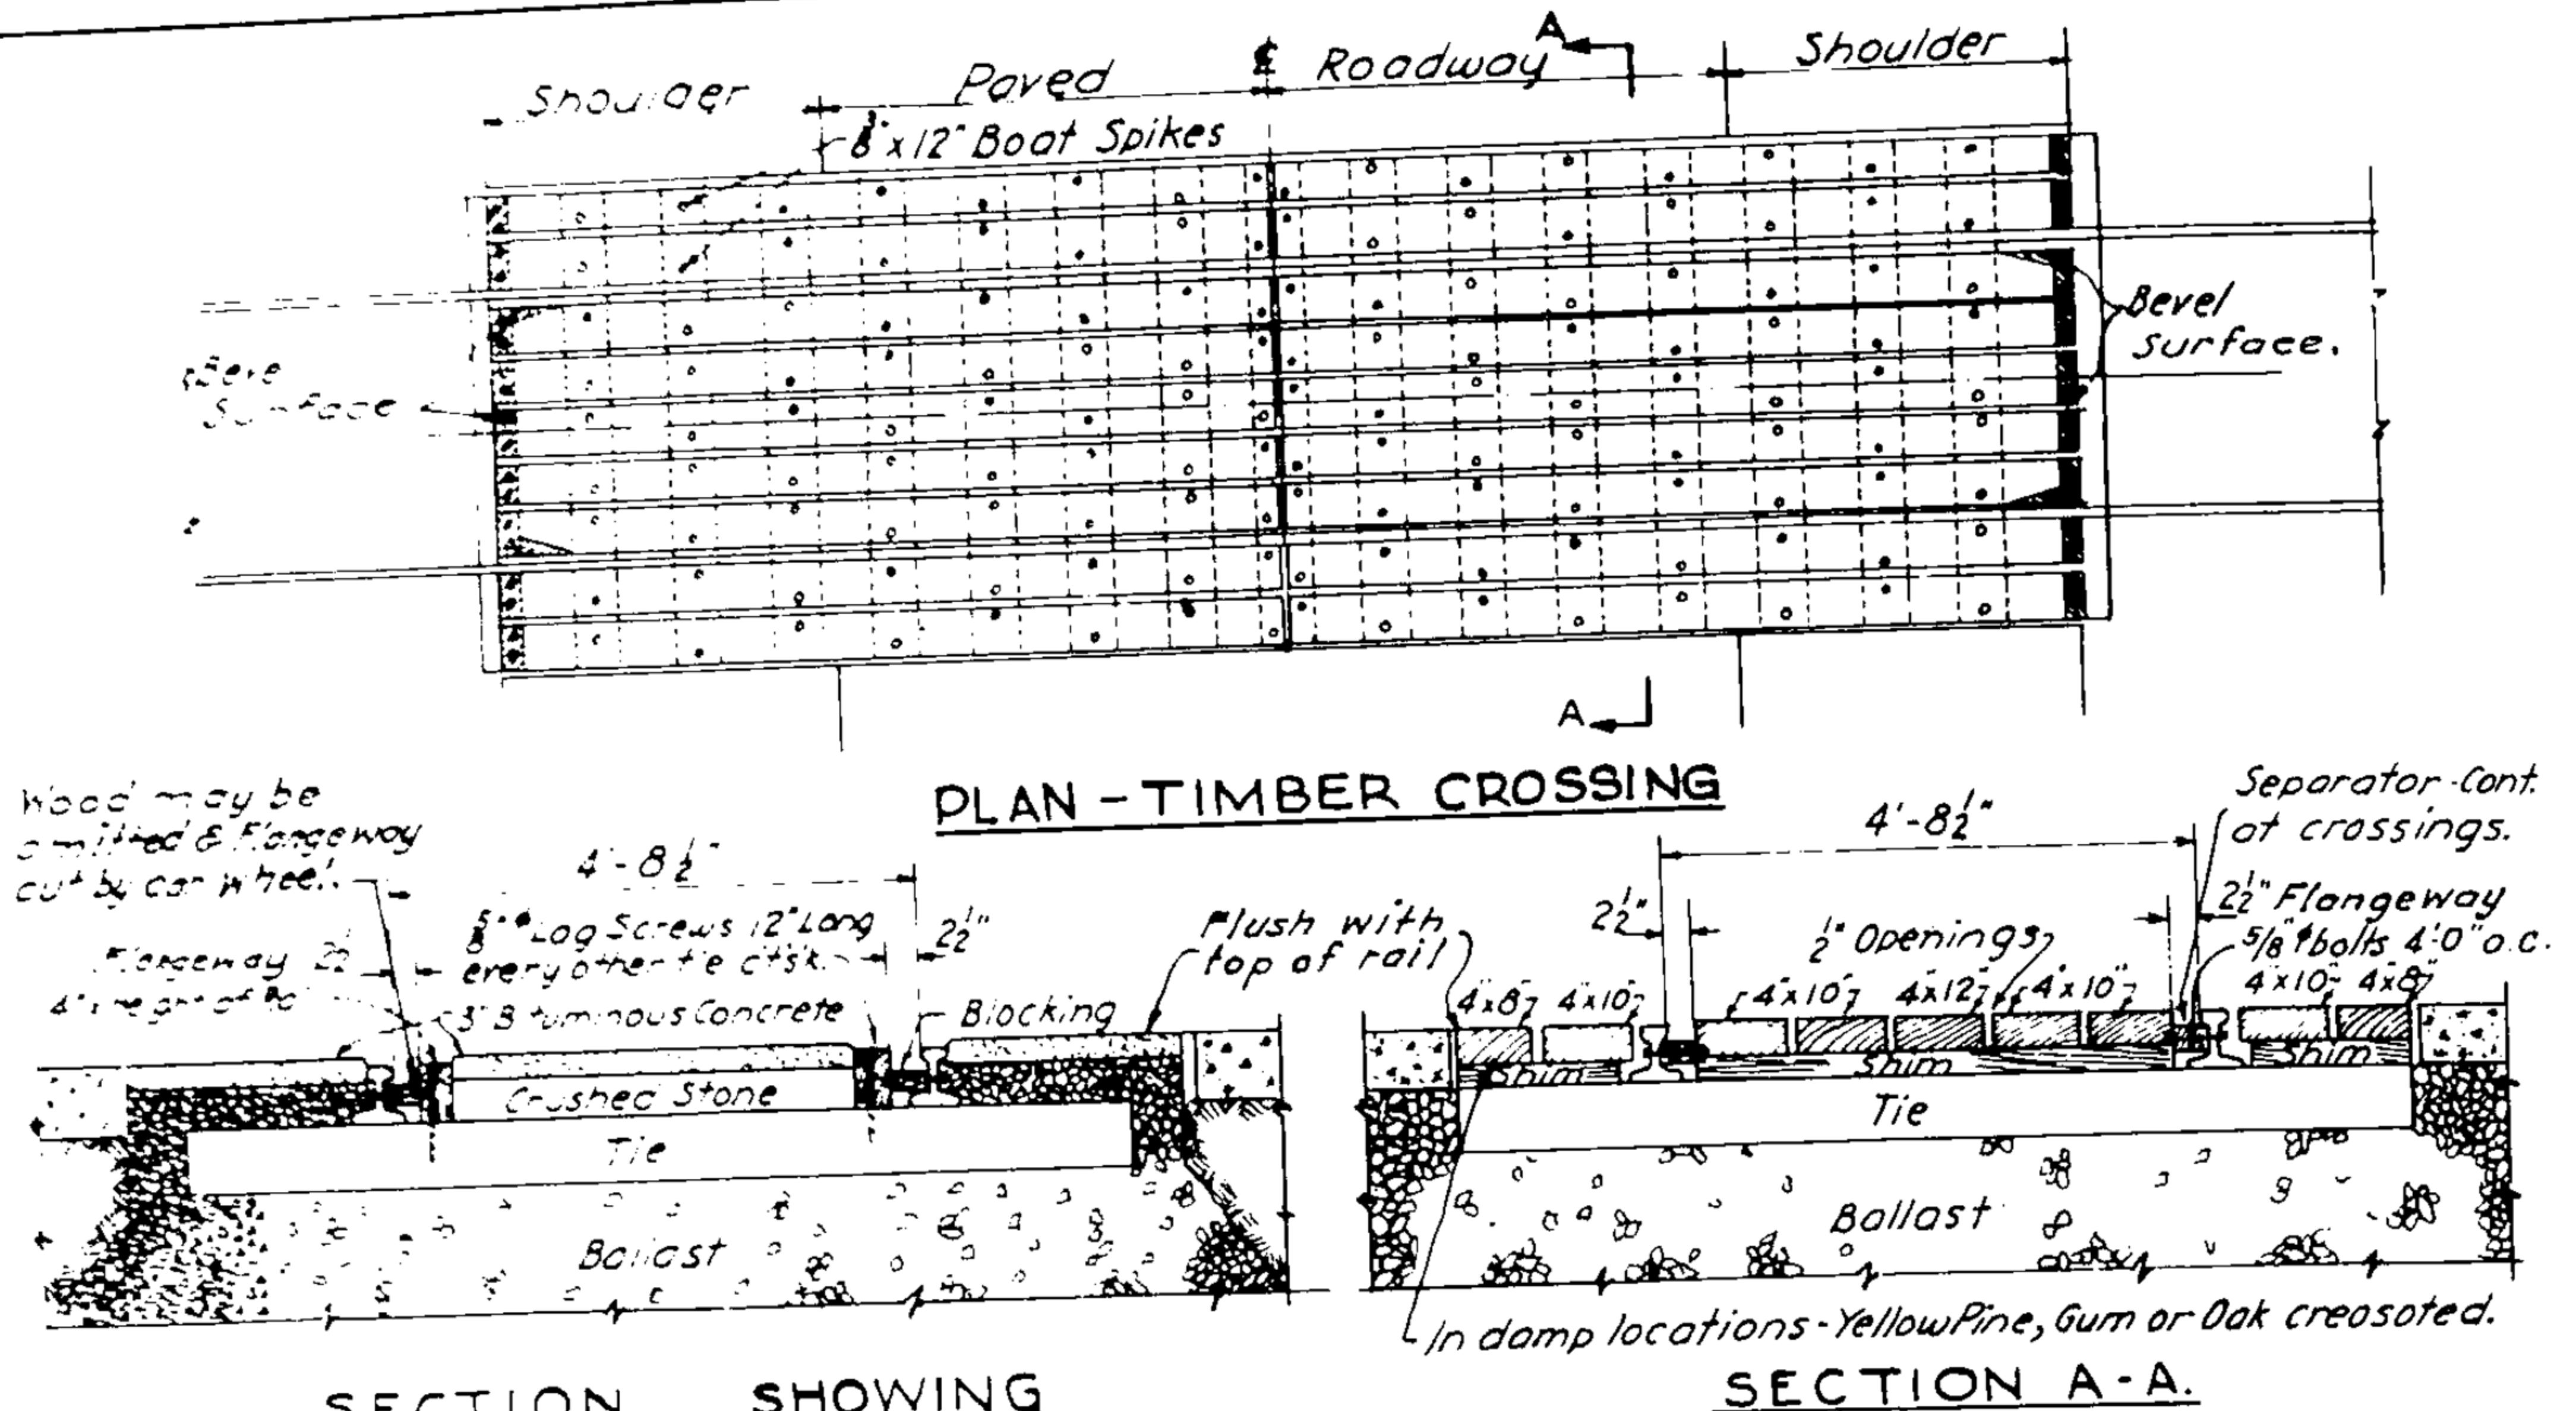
FIG. A - RAILROAD CROSSING CONSTRUCTION.
